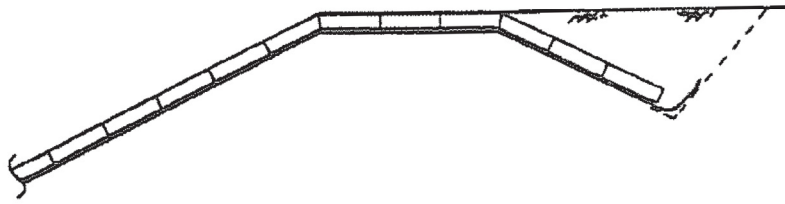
e Type I. - Top Protection with Anchor Trench
